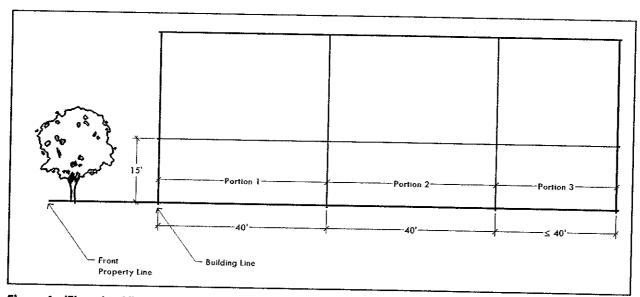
(Elevation View) Dividing Lot into 40-foot Portions to Create Side Setback Planes (Rear Setback Plane Not Shown)
